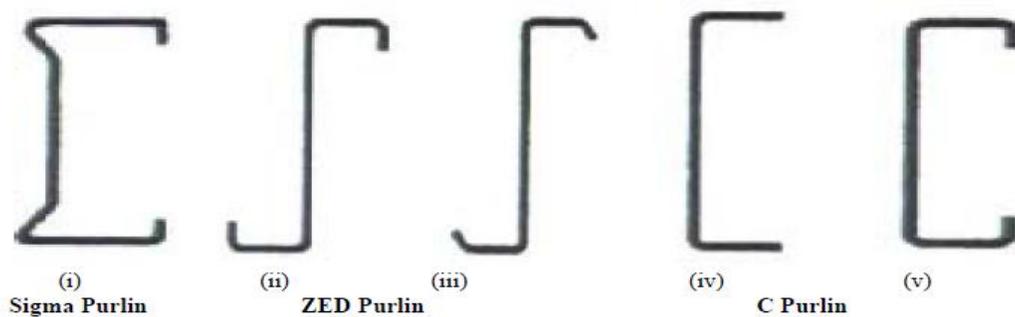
Typical Cold Formed Section Profiles used for purlin members
